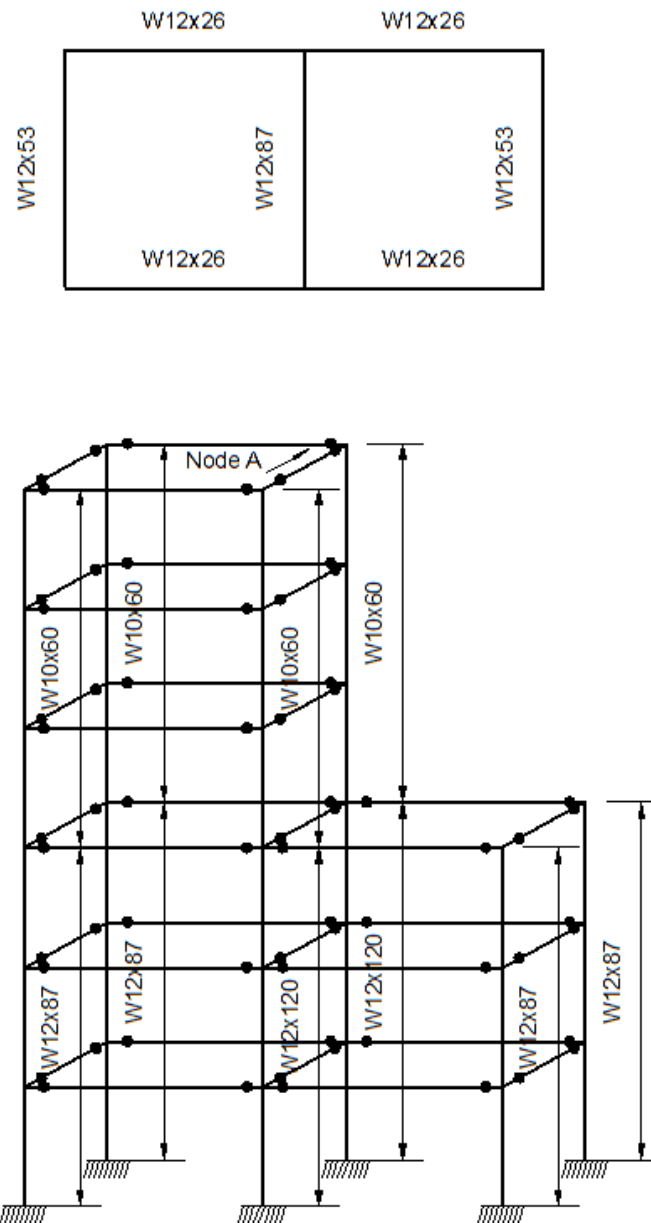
6 Story Structure with Beam to Column Semi-rigid Connections 3D Representation
